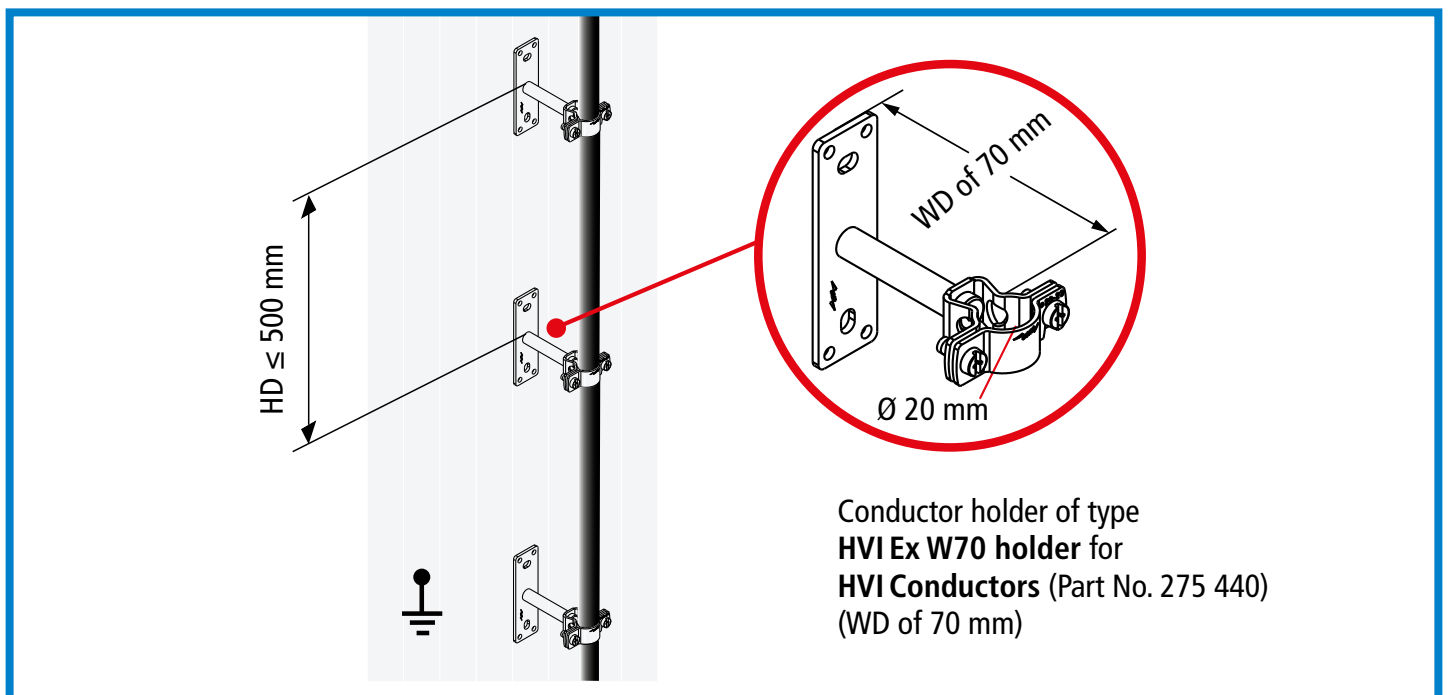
Installation in parallel to an earthed metal façade: holder distance of 500 mm; wall distance of 70 mm
